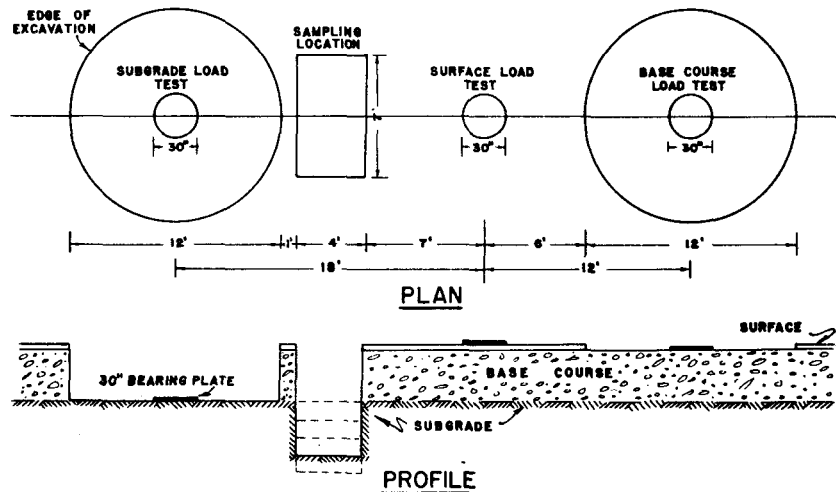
Diagram Showing Typical Arrangement of Load Tests and Sample Locations.
